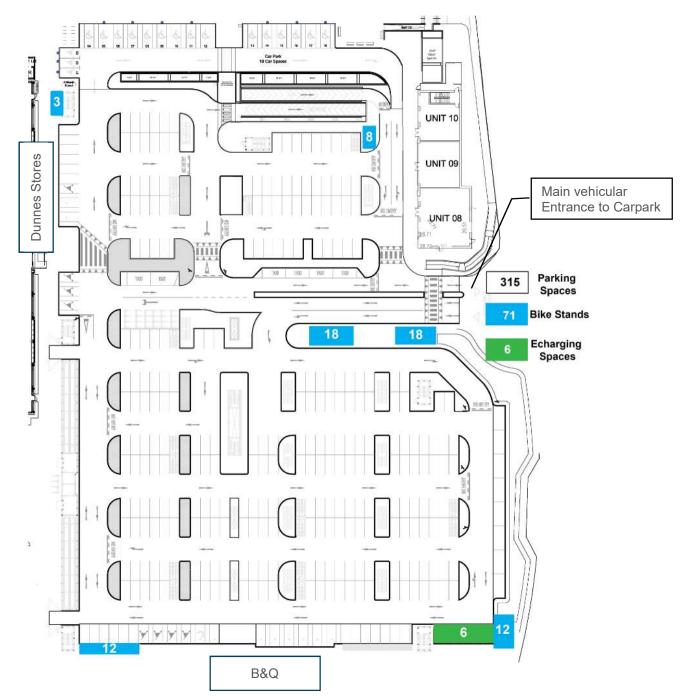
Overview of Gateway Retail Park Groundfloor Carpark
